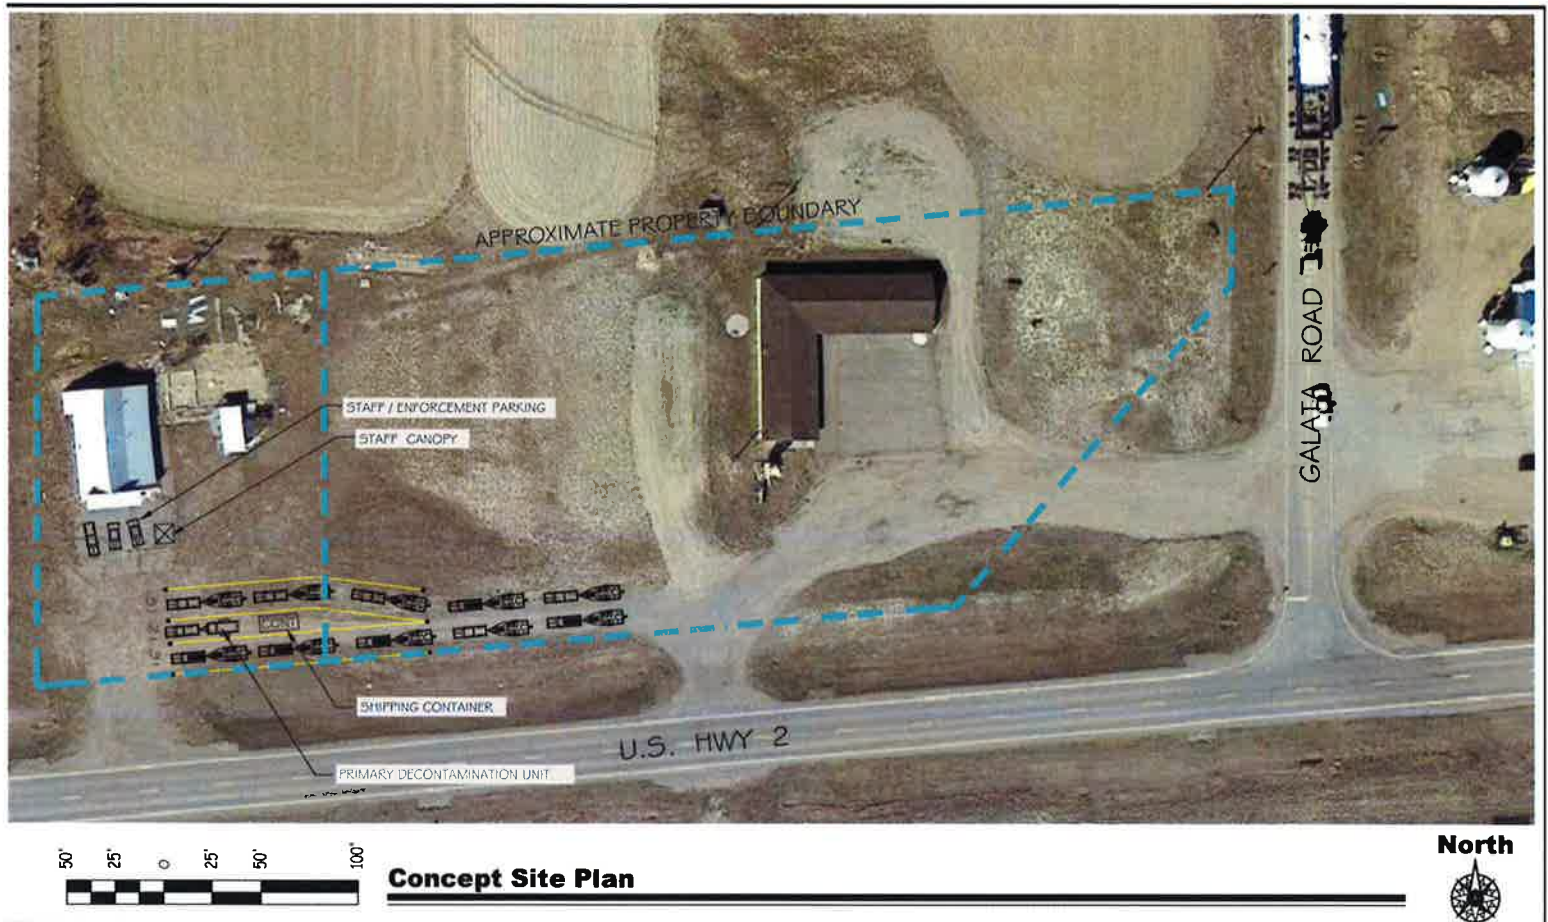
View of the proposed Galata AIS Inspection Station site
